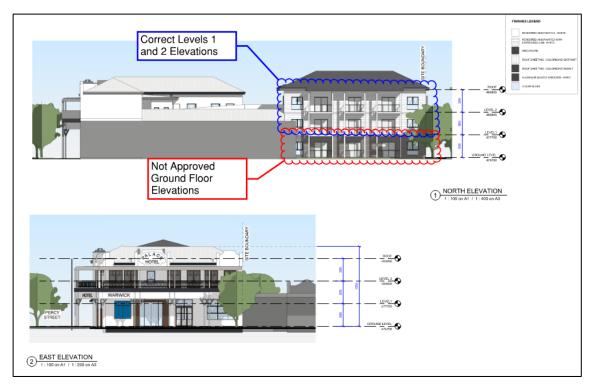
Northern and Eastern Elevations – Correct Level 1 and 2 Elevations (Amended by Council 19 August 2024)
